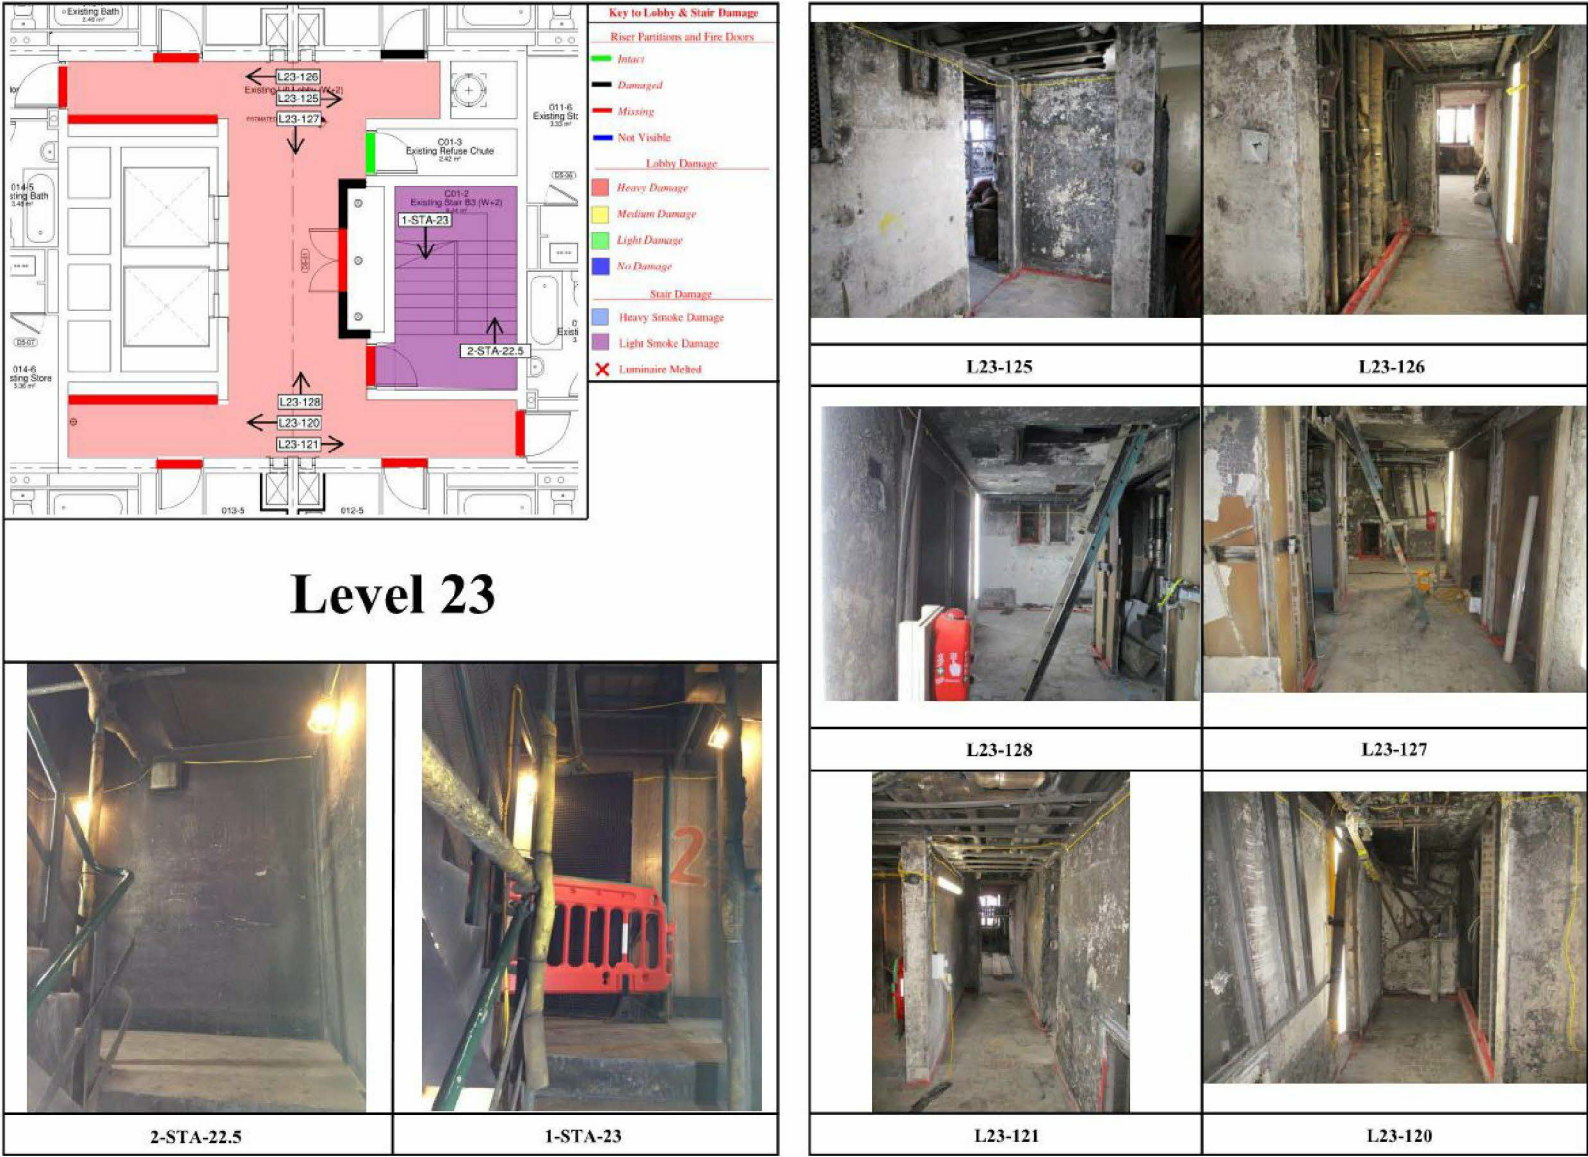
Record of stair and lobby damage from post fire site inspection – Level 23 (plan adapted from SEA00010474)
